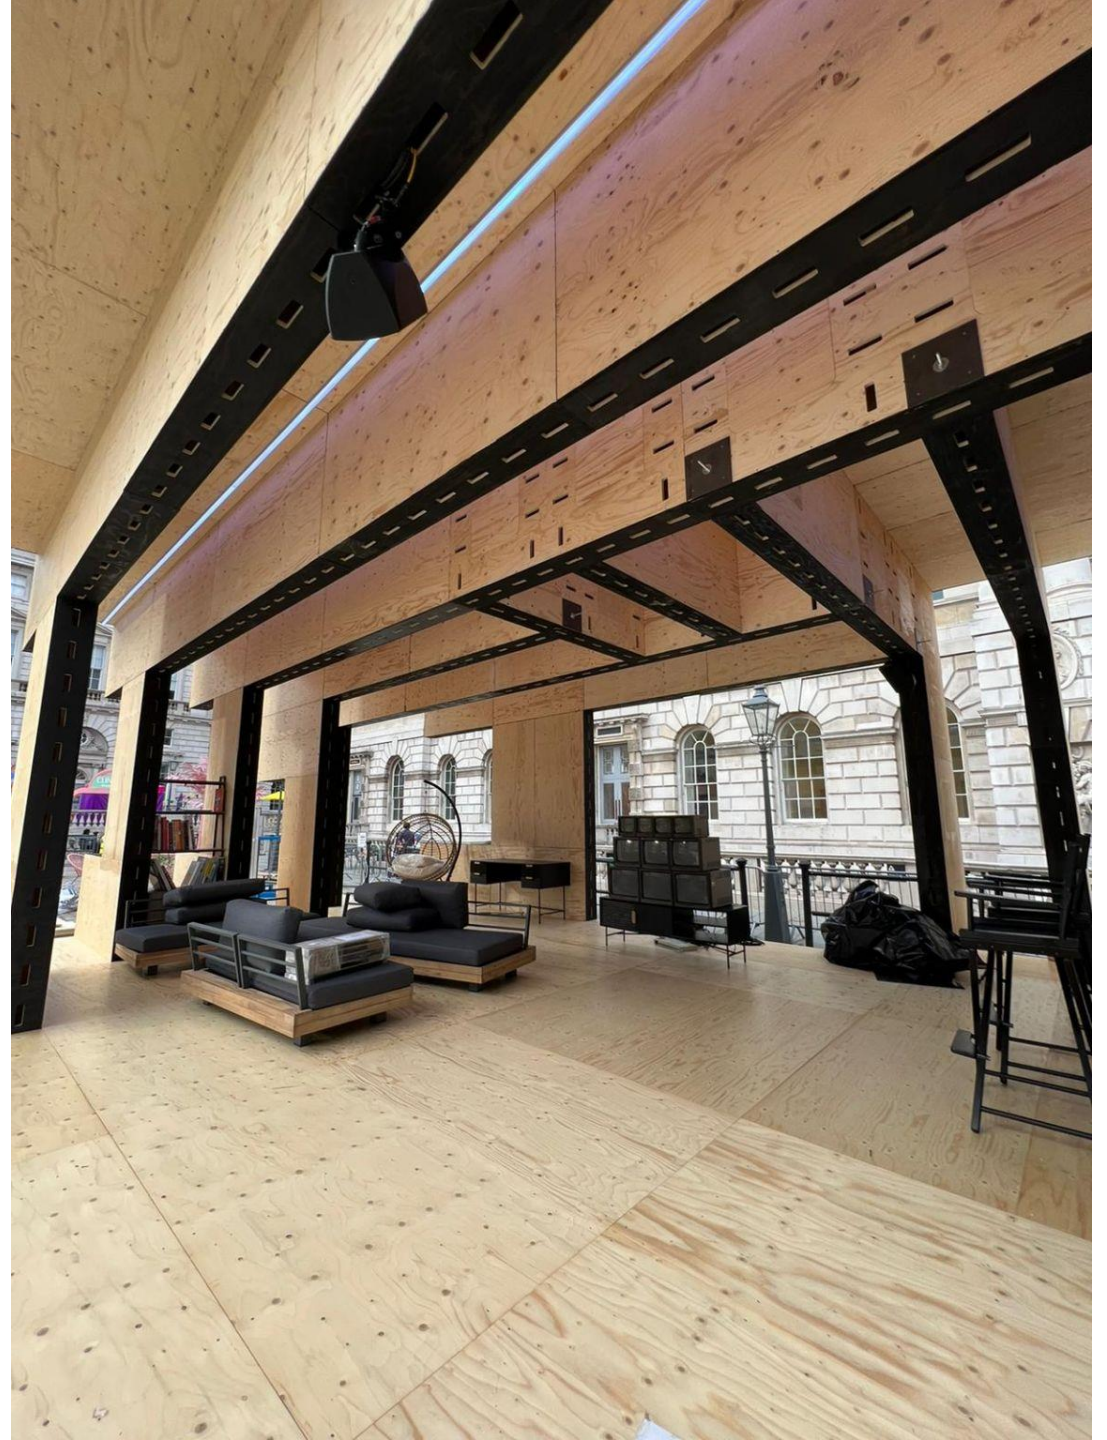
Test 2 – support spanning beam Somerset House structure – THIS BRIGHT LAND
